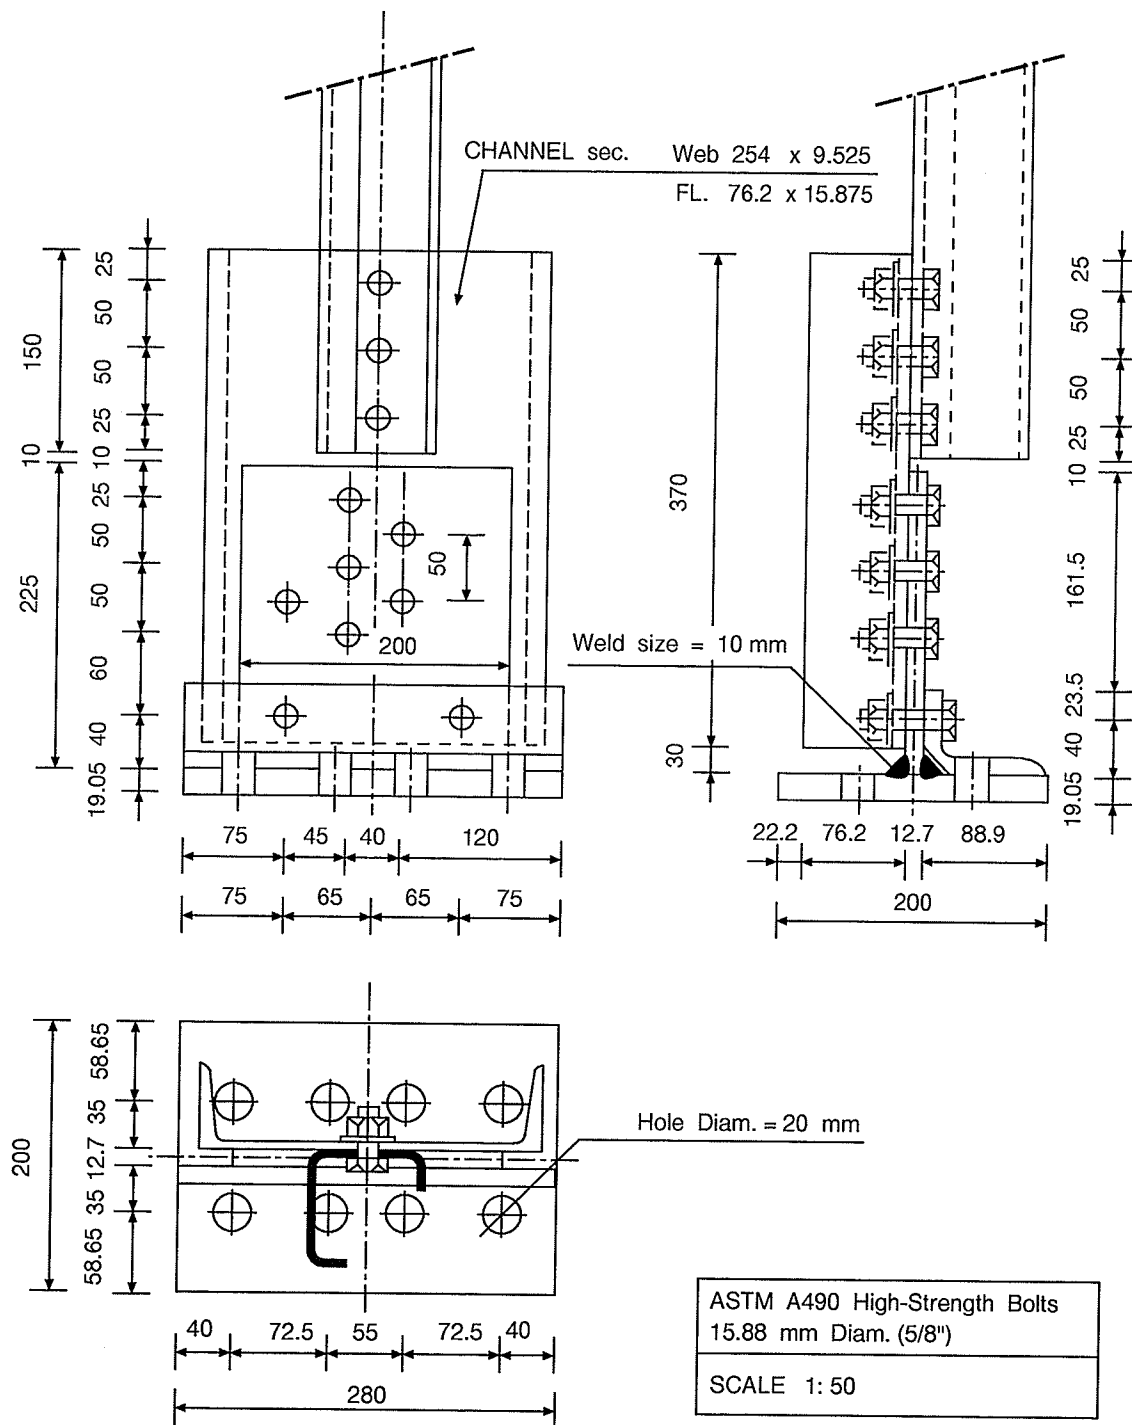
Connection Type "B" Used with Test Setup # 1.
